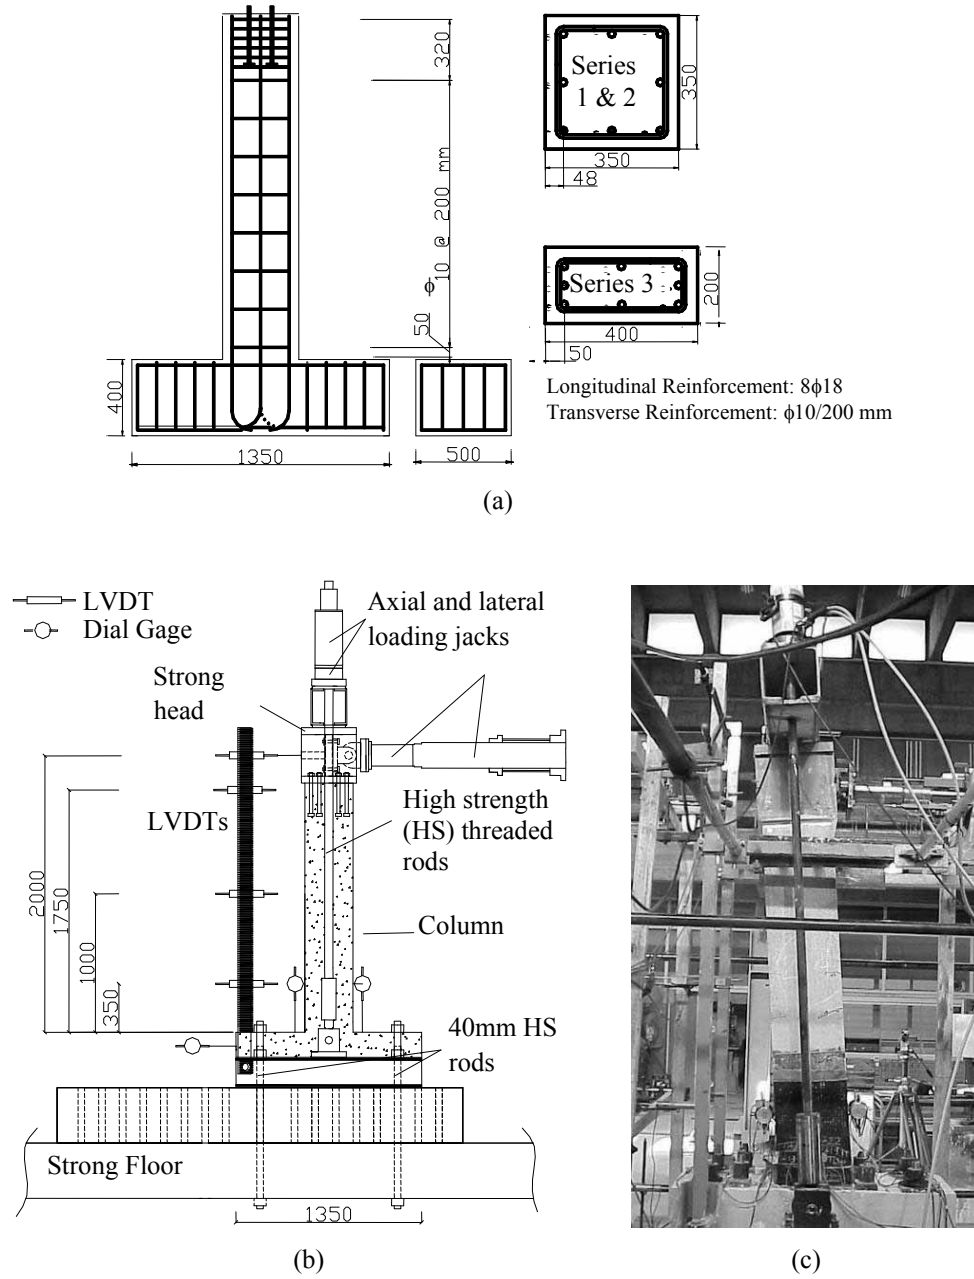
(a) The properties of test specimens, (b) and (c) Test setup
